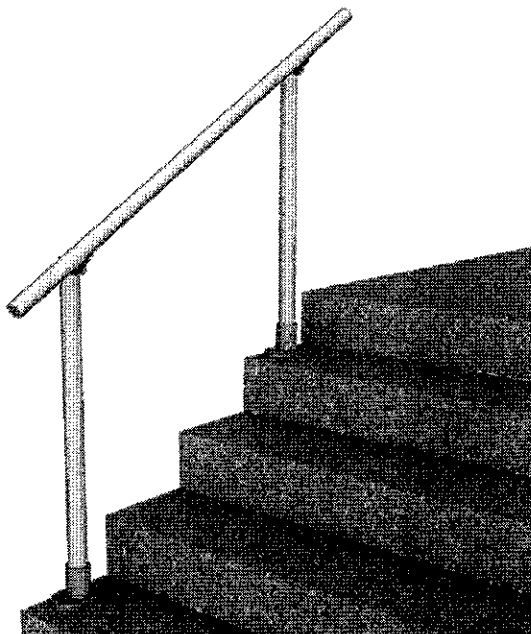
Rendering of a typical railing configuration provided by Simplified Building Concepts, the railing manufacturer. Refer to data sheet on Page 5.
